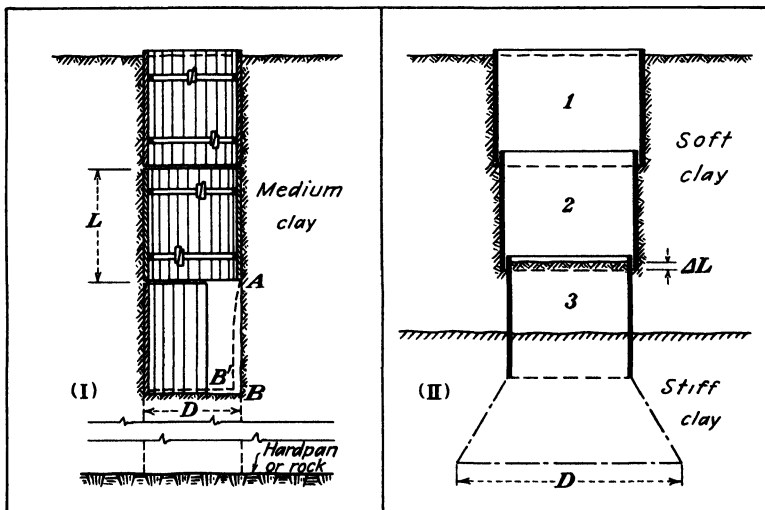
Construction procedures. (I) Chicago-type caisson through medium clay to hardpan. (II) Gow-type caisson through soft clay, belled out in stiff clay.
